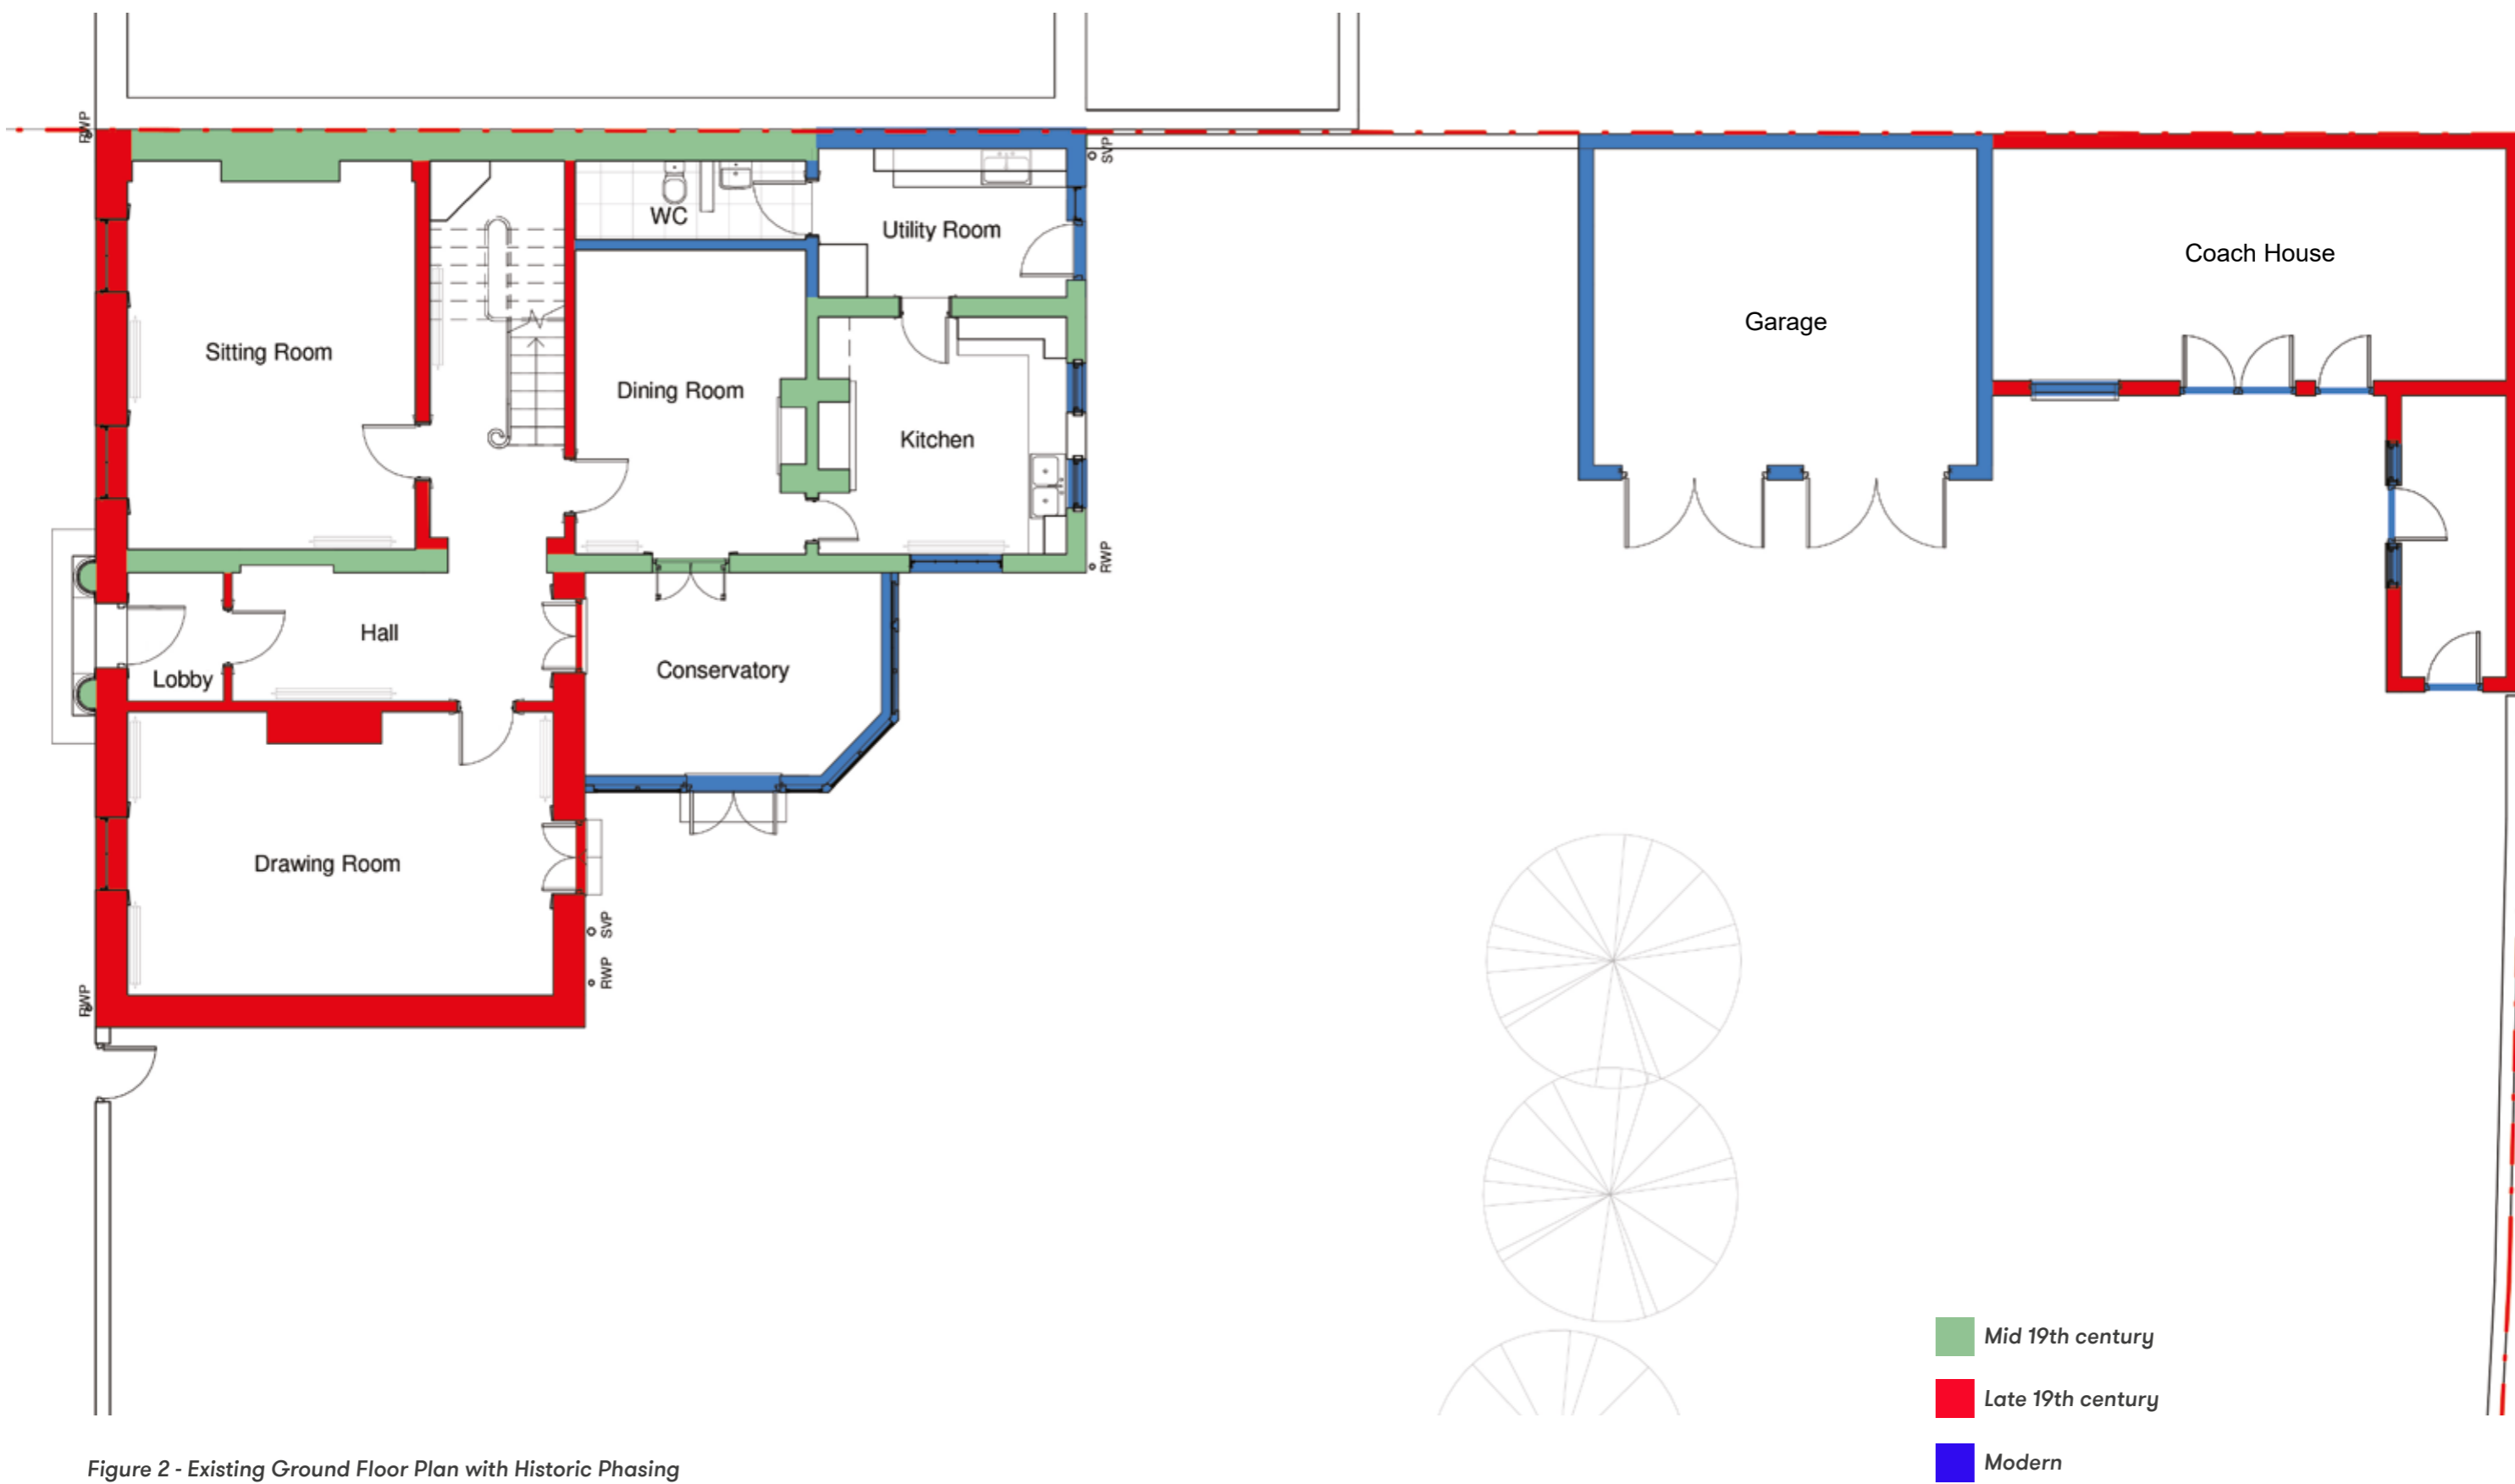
Existing Ground Floor Plan with Historic Phasing
